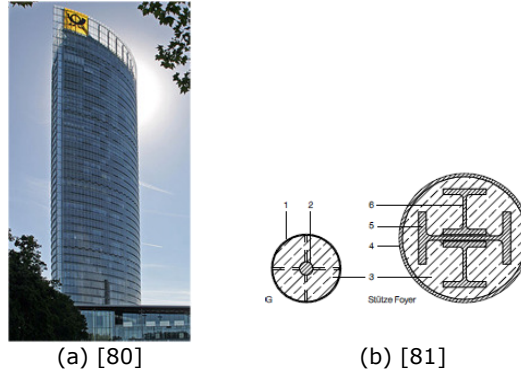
Post Tower in Bonn (a), and cross section of column (b)
